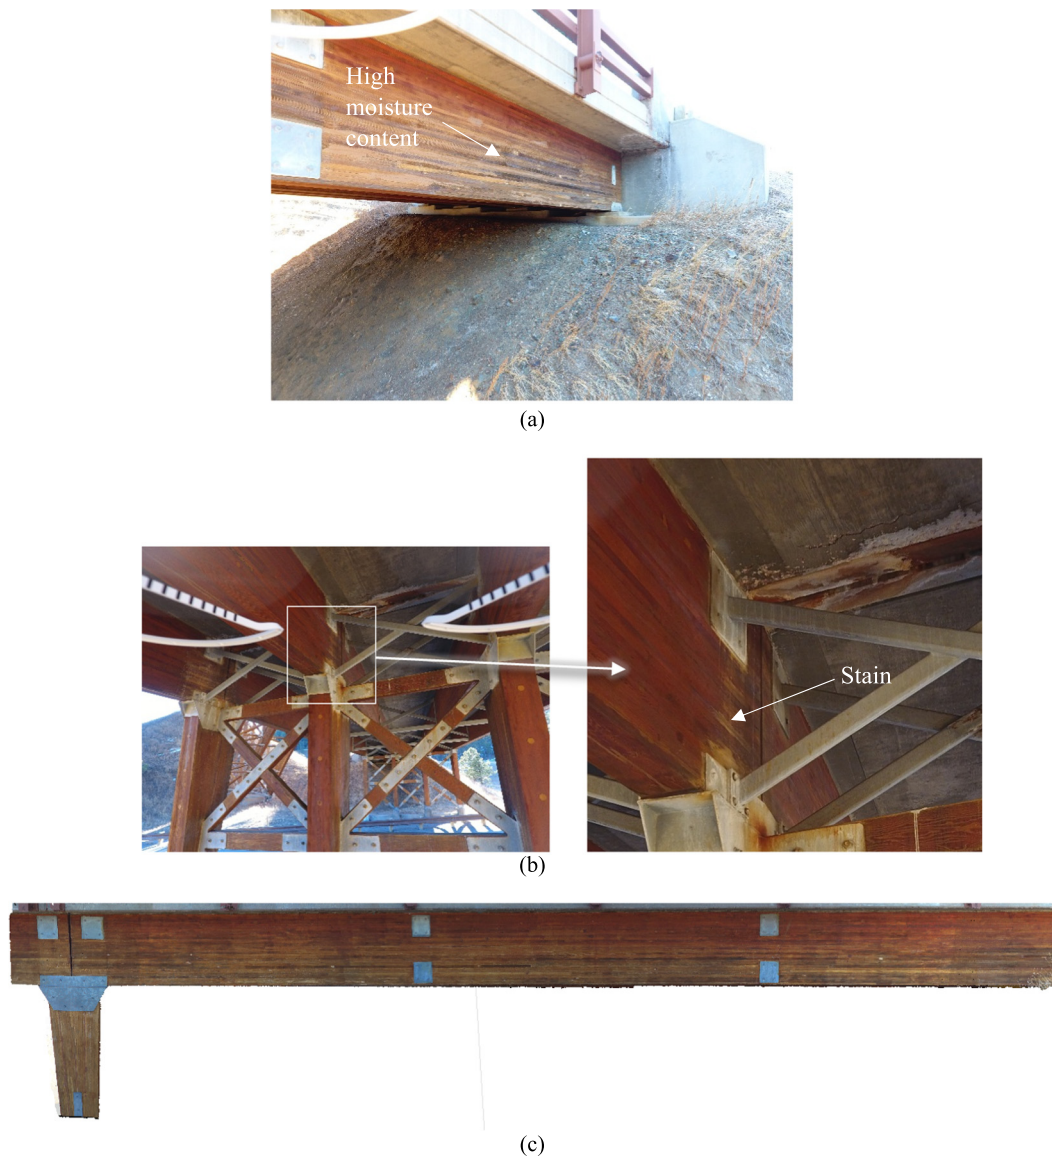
Sample girder damage detected using the drone (Taken by Luis Duque): (a) moisture damage on the side of Girder 4 between Joints 3 and 4; (b) stains on the side of Girder 3 at Joint 3; and (c) 3D virtual representation.
